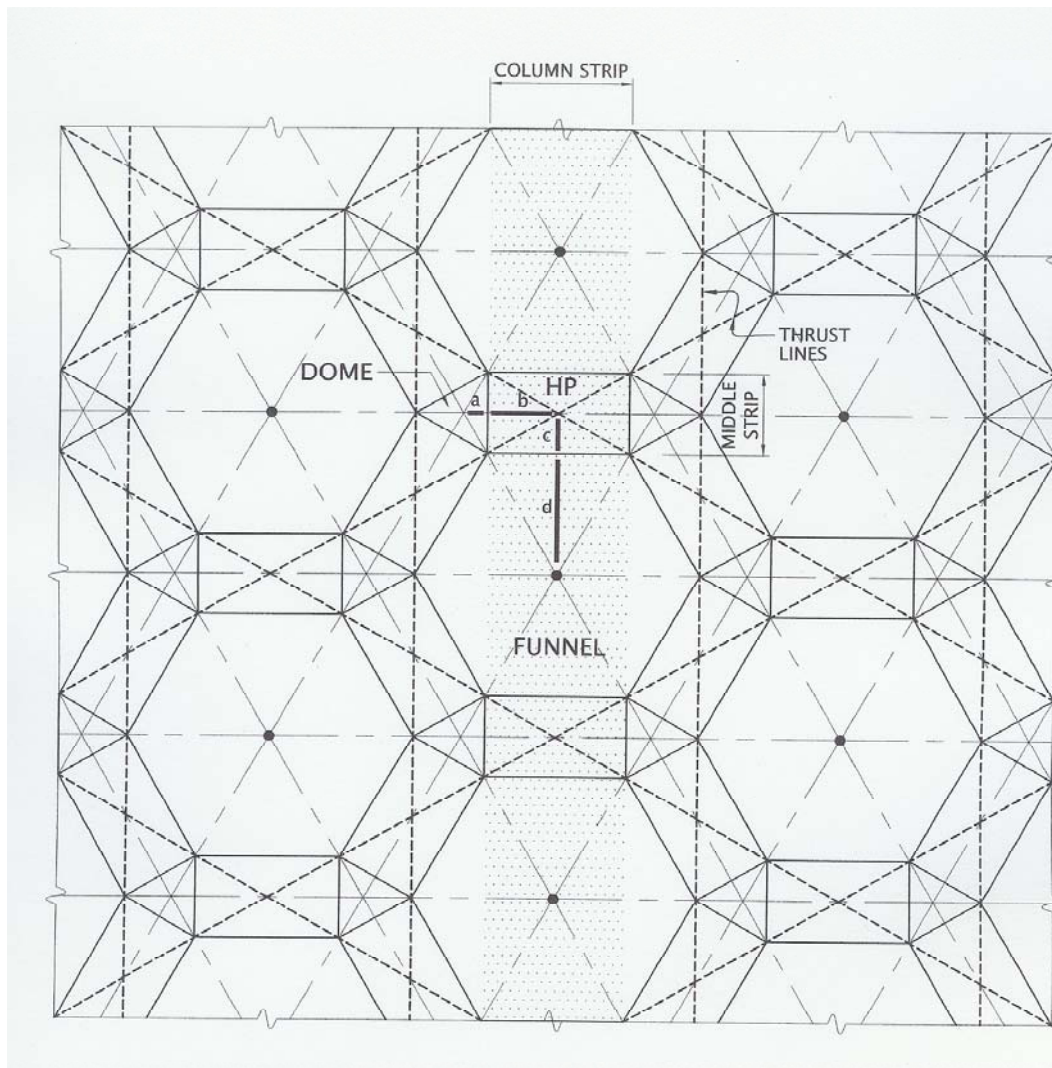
Structural Membrane configuration developing an equilateral-triangular column plan.
